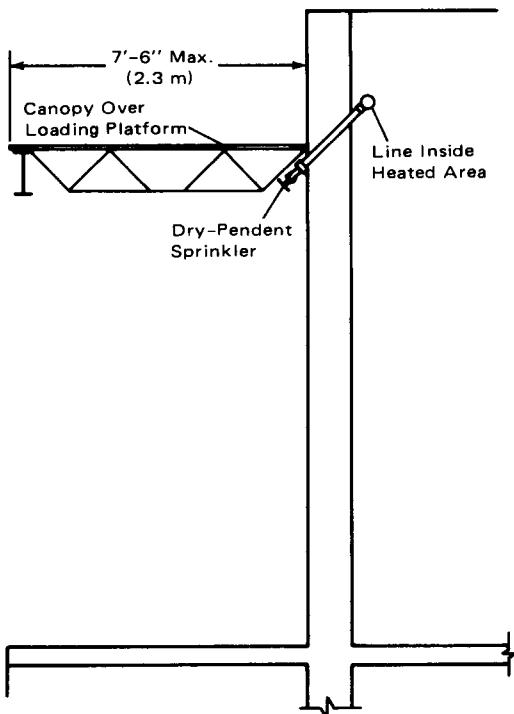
Dry-pendent sprinklers for protection of covered platforms, loading docks, and similar areas.
